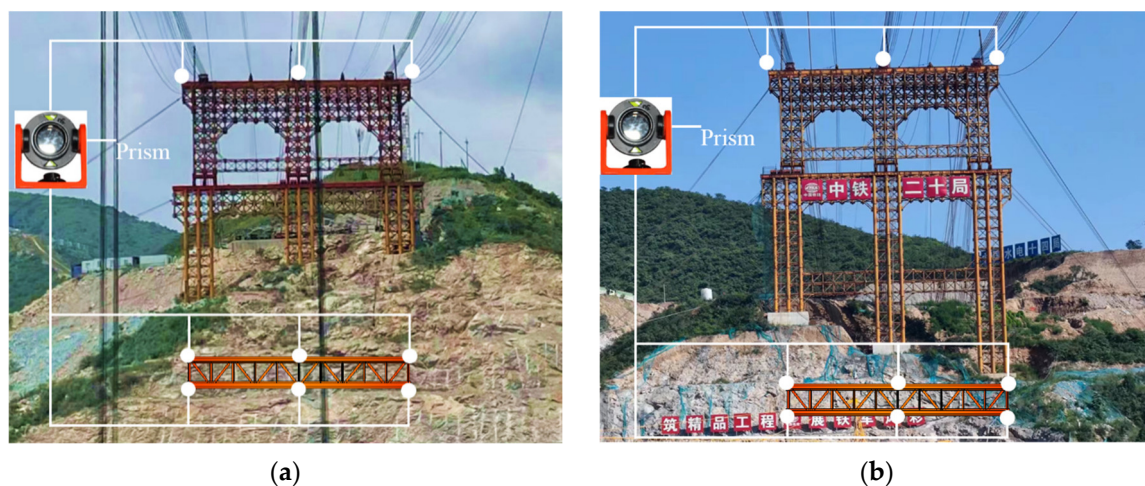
Tower and measurement point layouts for engineering case: (a) left bank; (b) right bank.
